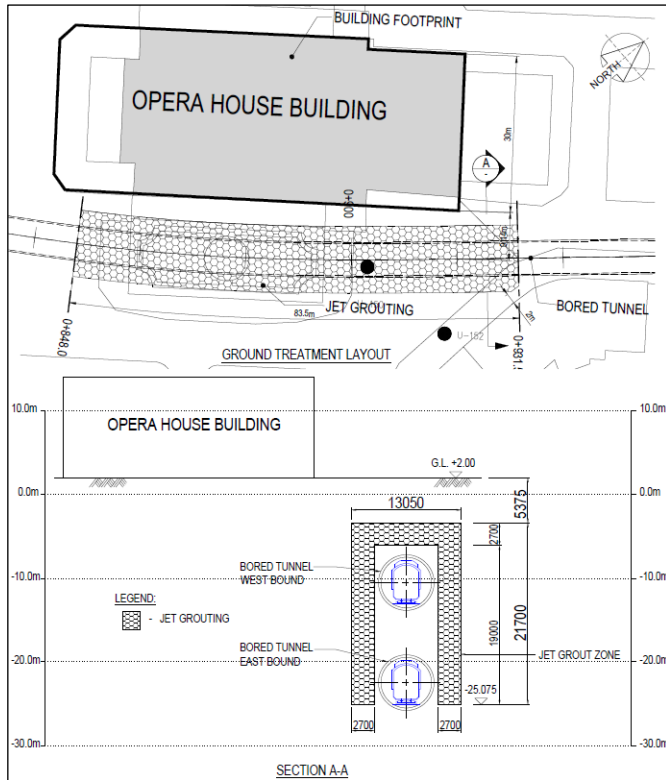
Jet grouting column as a protective measure against tunneling-induced settlement
